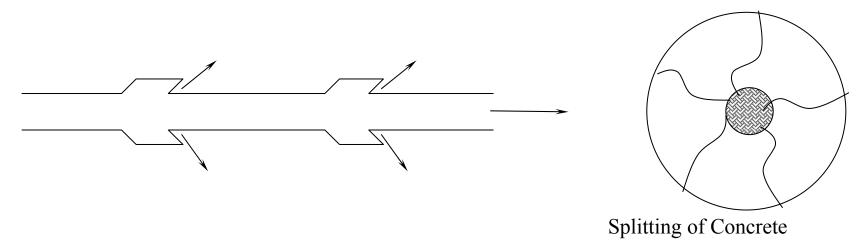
Cracking in Concrete Due to Pull in Steel Bar.
